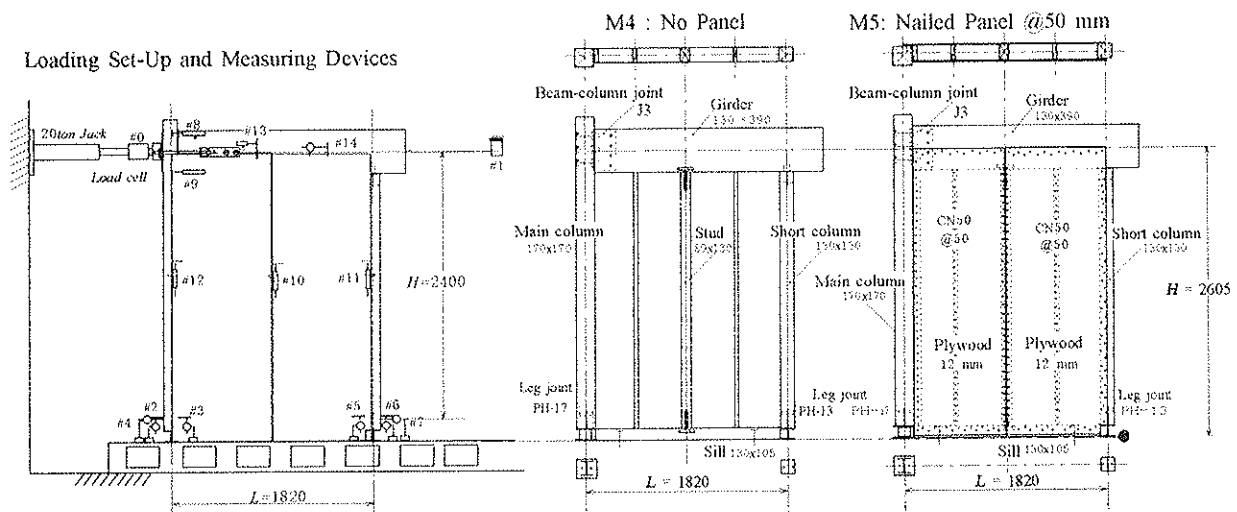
Test set-up and location of deflection measuring devices common to most specimens as well as details of test specimens ( $L = 1820$  mm, main column's cross section is 170 x 170 mm)
